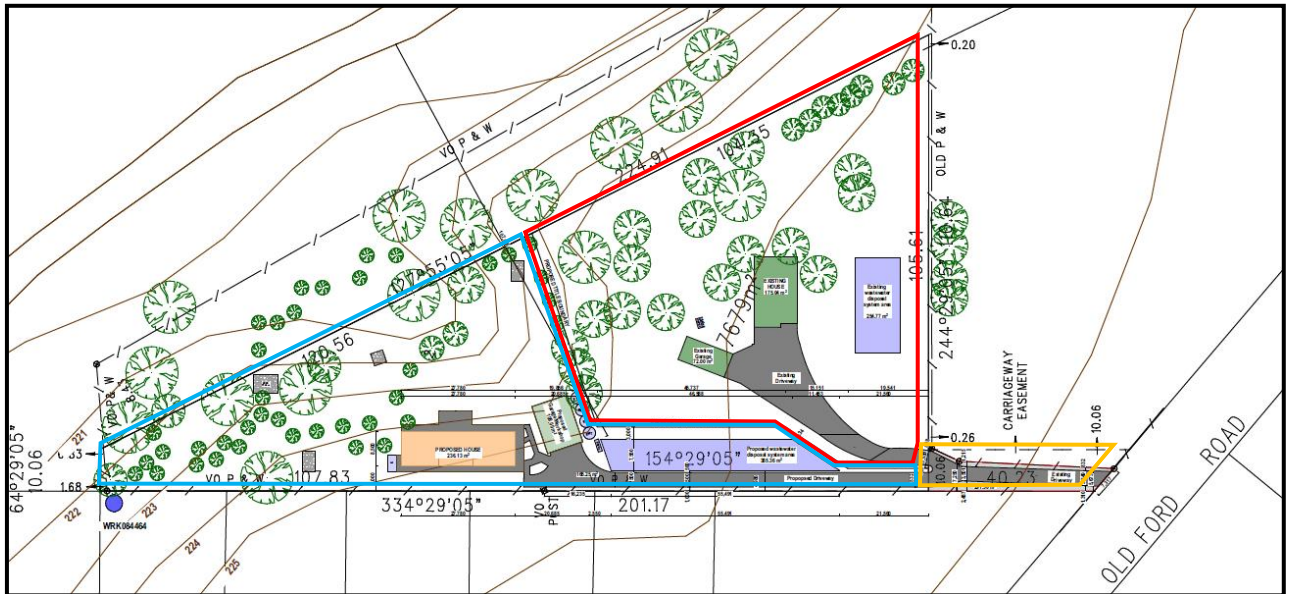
Indicative site plan showing access, effluent disposal field and building footprints
